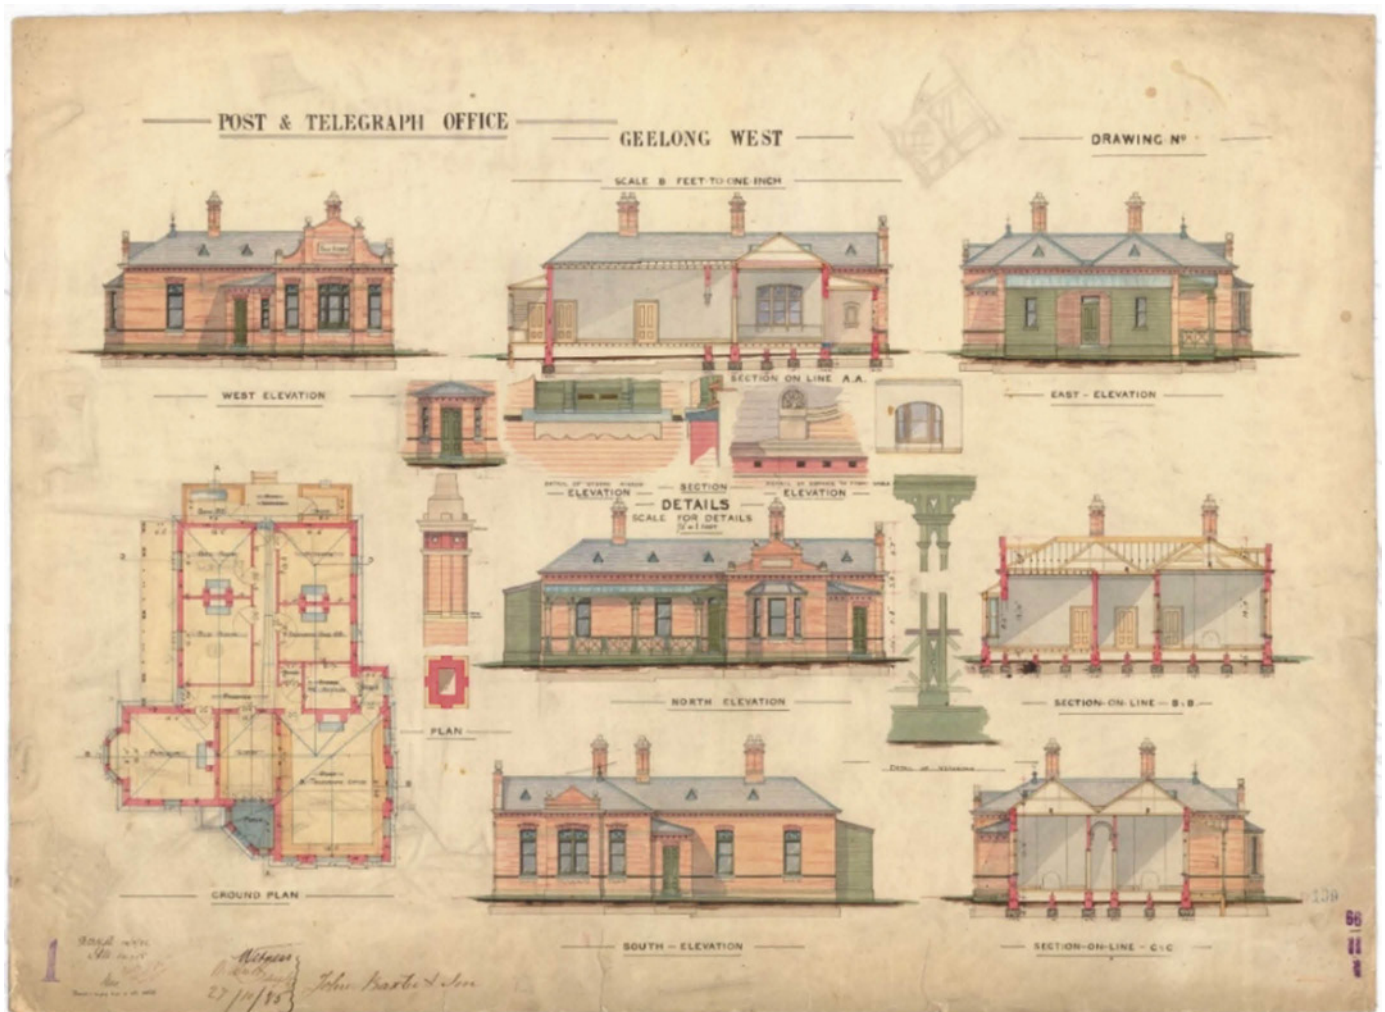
G.B.H. Austin, Post & Telegraph Office Geelong West, Floor Plan, Elevations, Sections & Details, 1885. Source: NAA: B3712, drawer 66, folder 11, National Archives of Australia.
